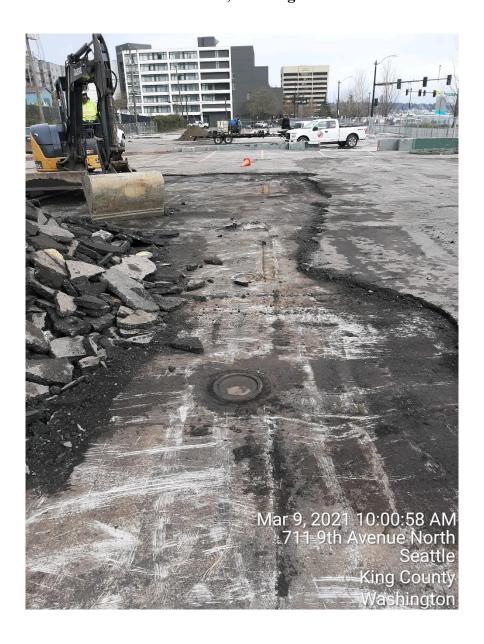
UST-A excavation lined, backfilled, and compacted, viewed from south.
